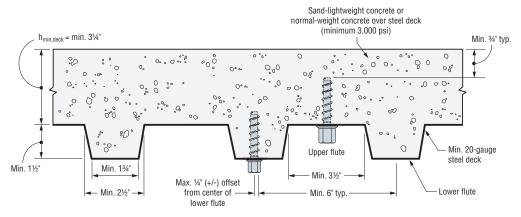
THDB25158RH and THDB37158RH Installation in Concrete over Steel Deck
